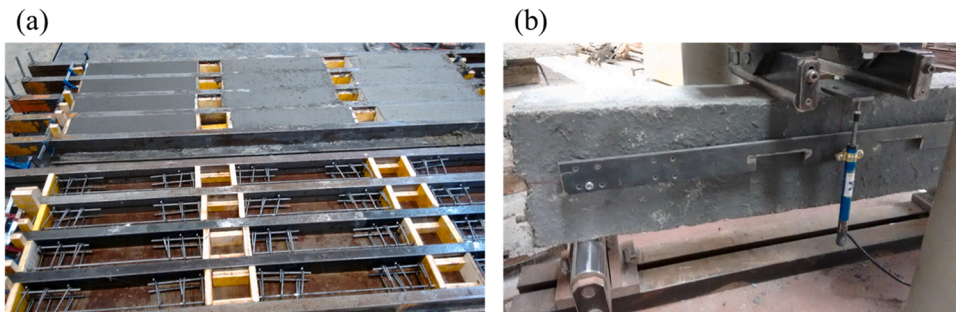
UHPFRC short beams: (a) overview of the casting zone and (b) the 4PBT setup.
